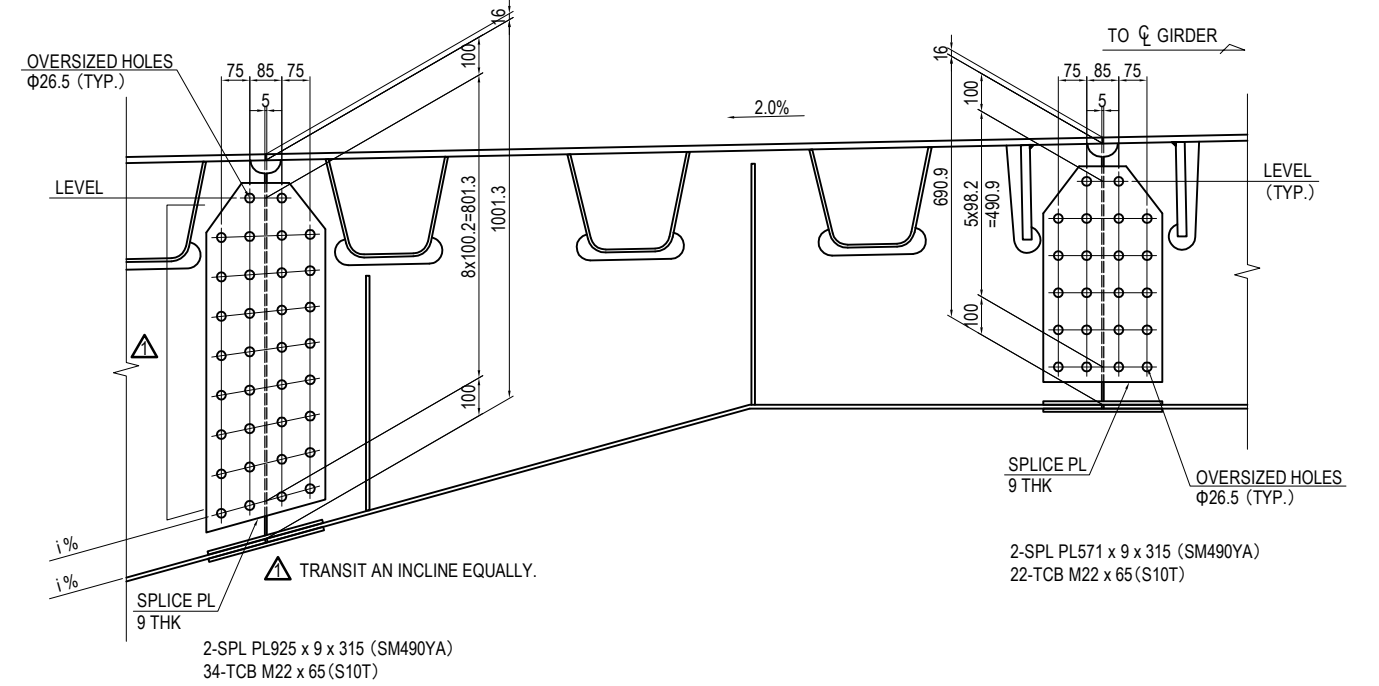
DETAIL OF MAIN GIRDER STANDARD (6) S=1:20
